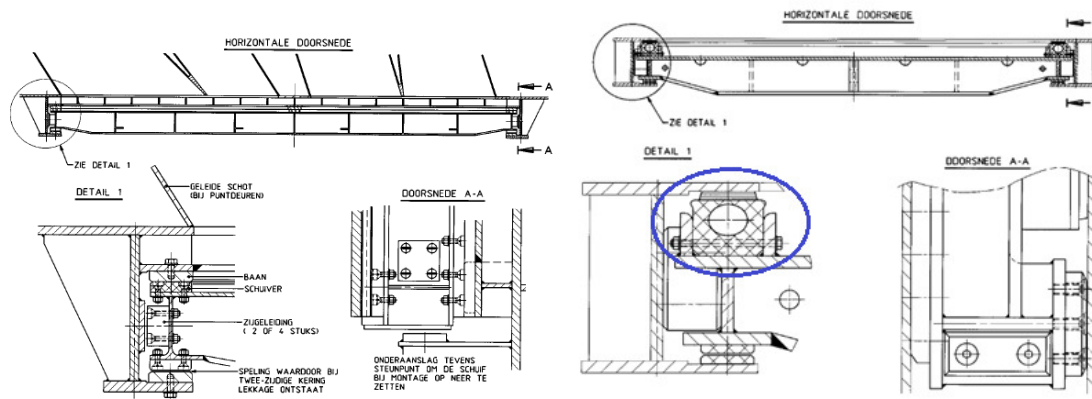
(L) One-sided retaining valve design [24] & (R) Two-sided retaining valve structure [24]
